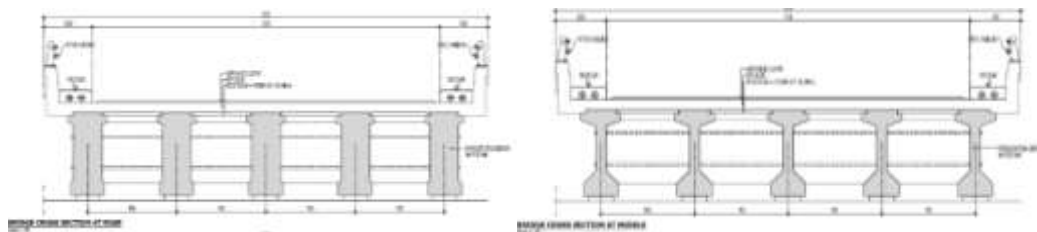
Cross-section of the bridge at the abutment (left) and the mid span (right).
